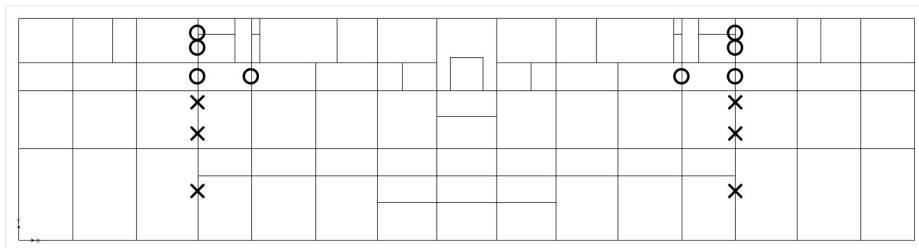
Damper Placement at roof floor (SR-X); MSSSA: 10 dampers
